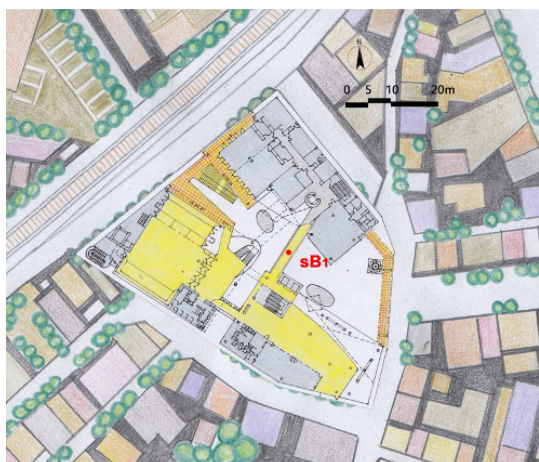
The skybridge (sB) between the north and south building. (Source from: drawing and photo from the author)
